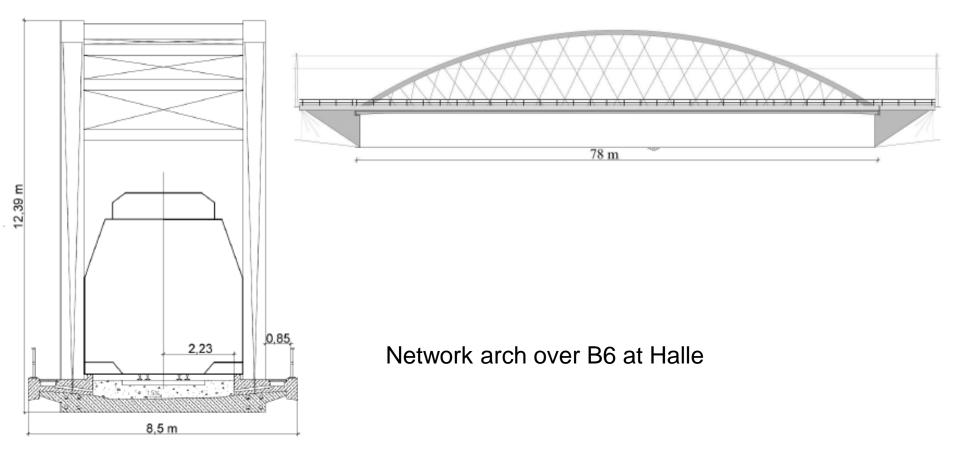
Shows an early suggestion by Prof. Marx for a cross-section of the railway bridge over B6 at Halle
